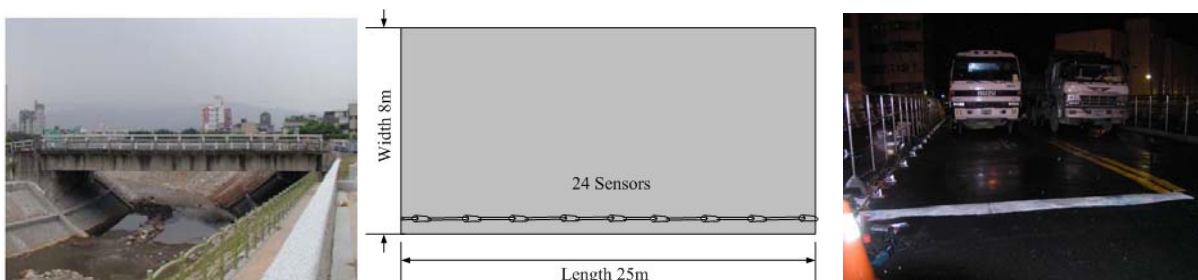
Left, side view of bridge MD01. Center, layout of 24 FBG bending gauges on one side of the bridge above a main beam. Right, static loading test being conducted.
